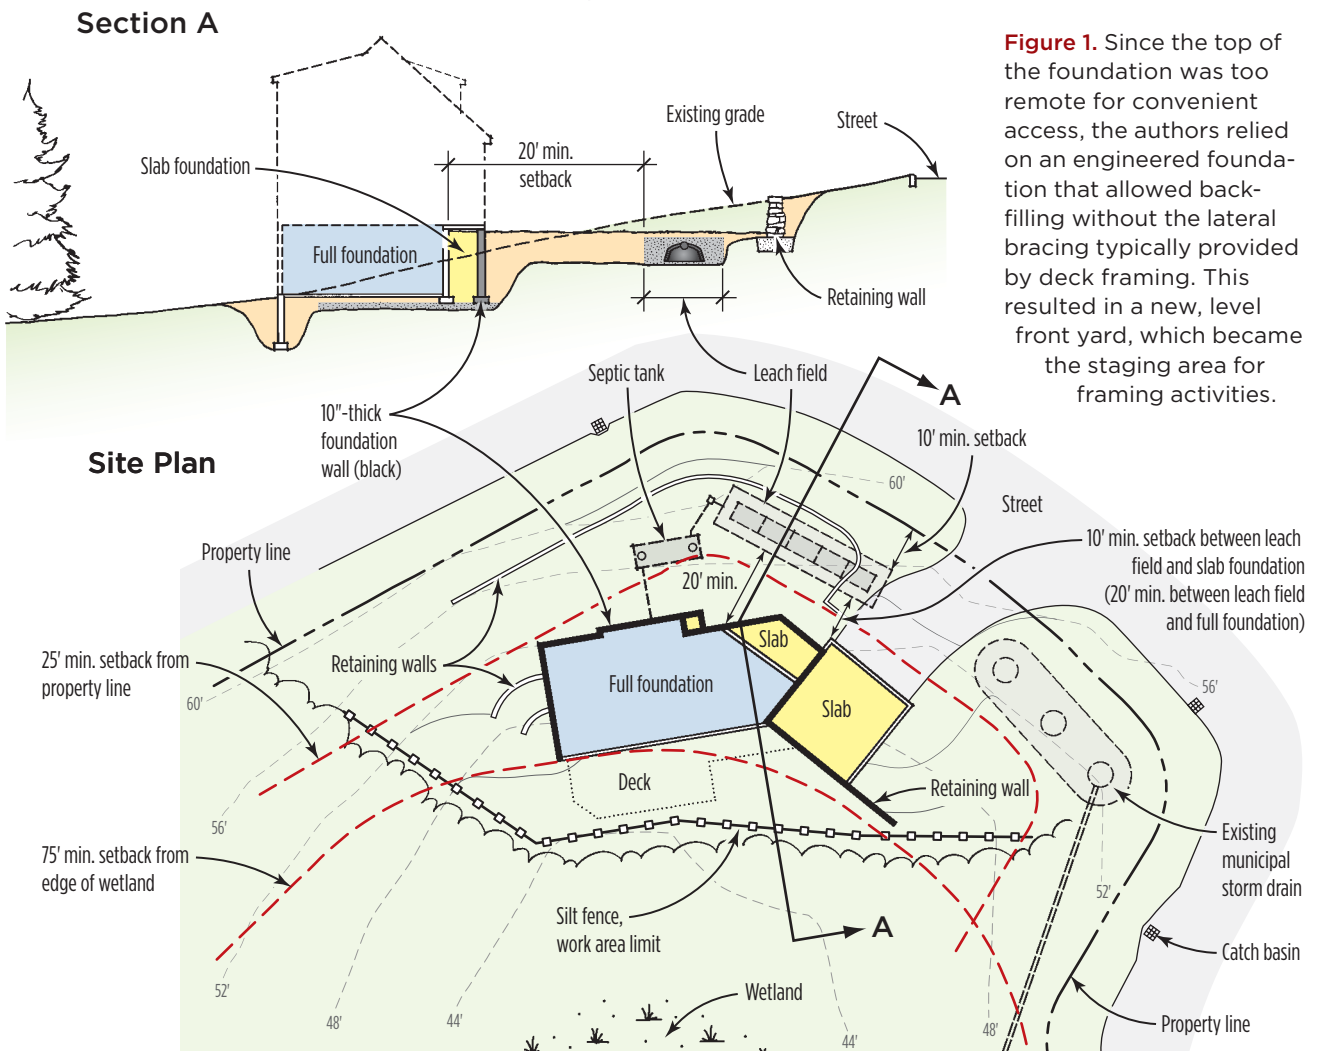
Since the top of the foundation was too remote for convenient access, the authors relied on an engineered foundation that allowed backfilling without the lateral bracing typically provided by deck framing. This resulted in a new, level front yard, which became the staging area for framing activities.
